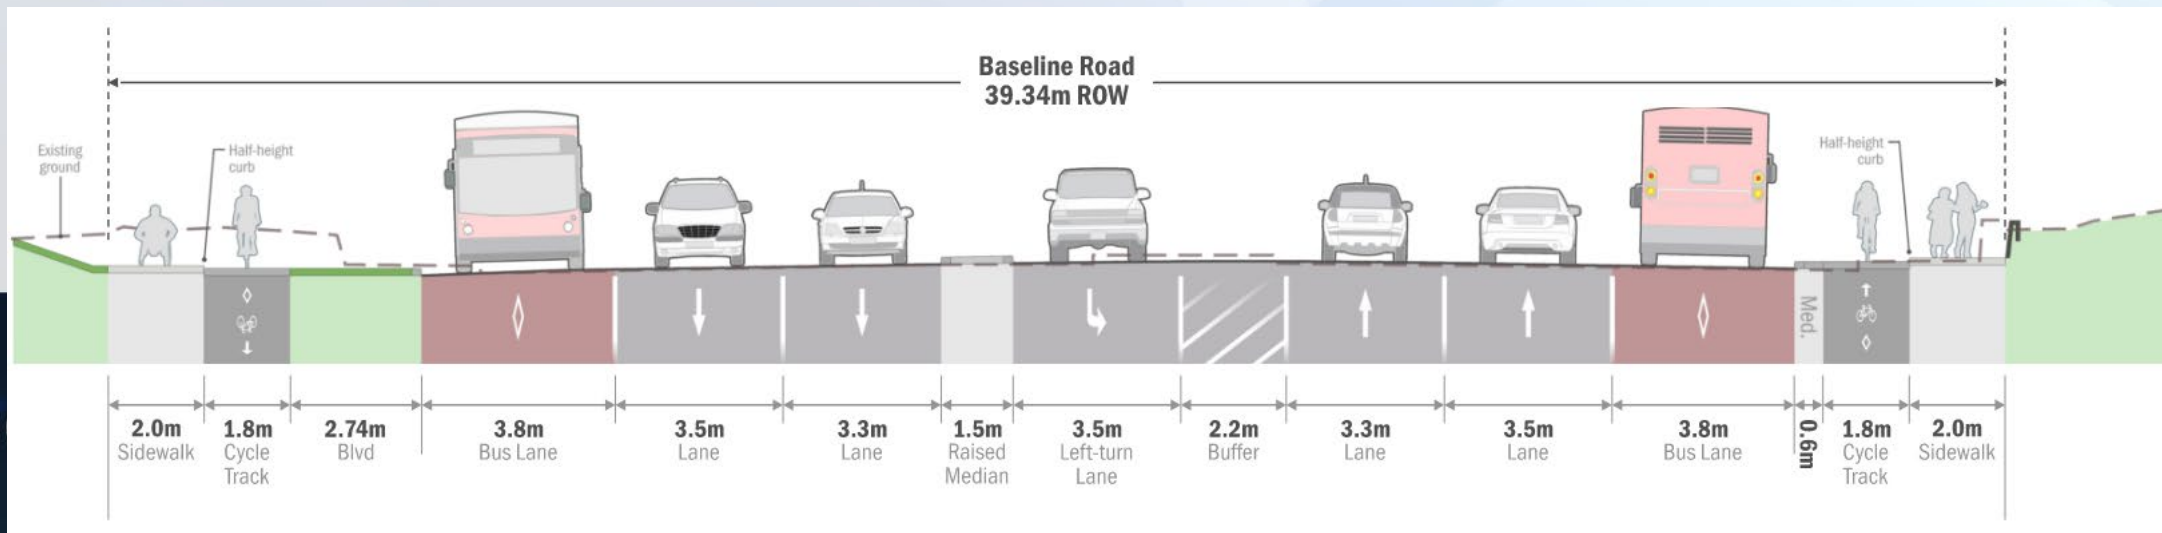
Typical cross section looking east - west of Greenbank Road intersection on Baseline Road
